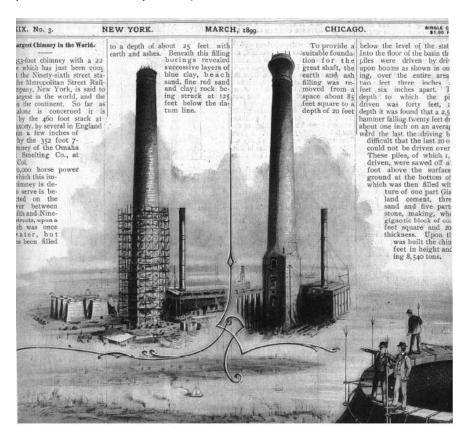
96th Street power station's great chimney was 353 feet high, just a few inches taller than the tallest stack on the continent located at a smelter plant in Colorado. (Power, March 1899)
